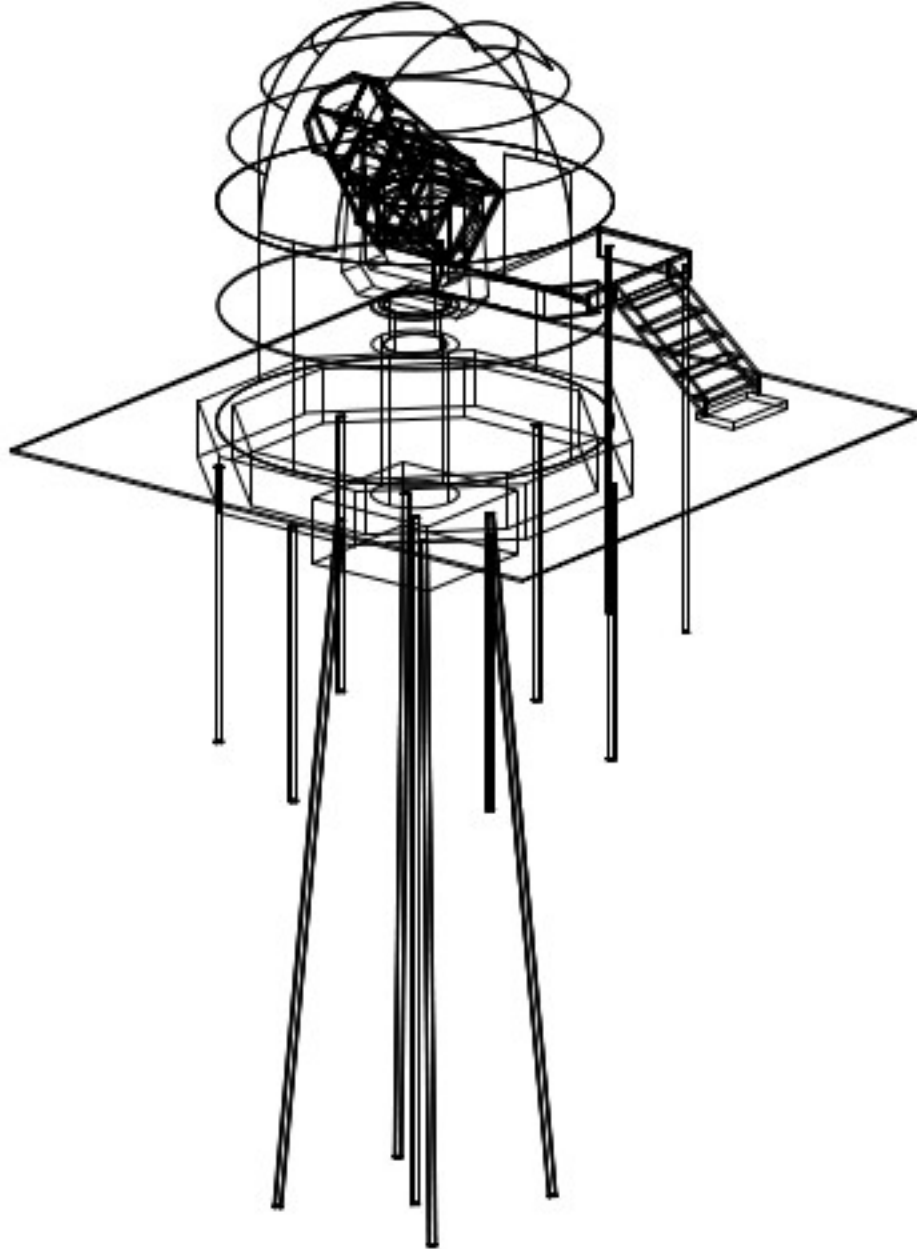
Scale perspective drawing of the BNLO observatory. Ground level is represented by the thin square plate and the ground below has been removed to show the piles installed below the telescope pier and dome wall foundations.
